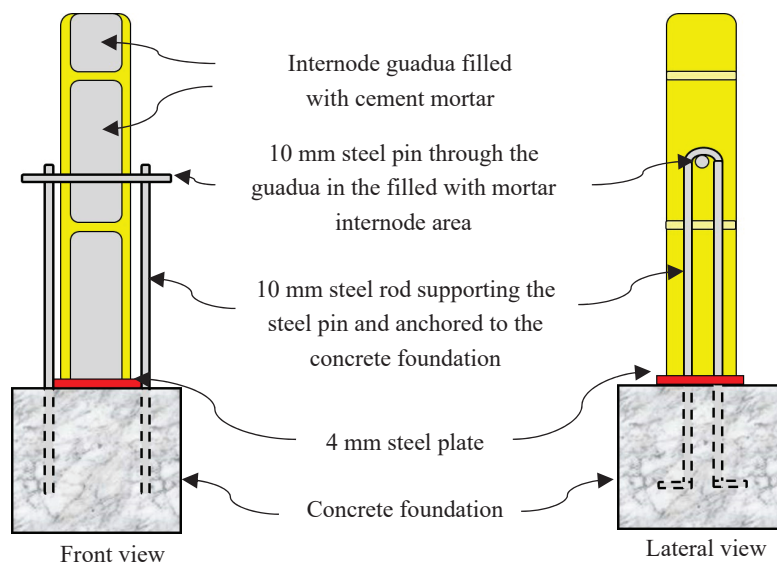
Example of improved connection between vertical guadua elements and foundation.
